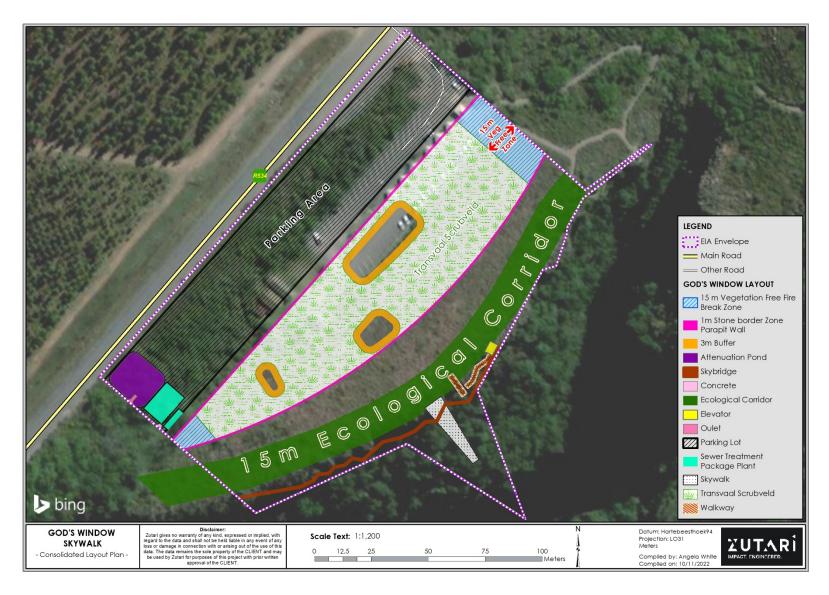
Tourist facility layout (visitor's centre, skywalk, skybridge and parking area)
